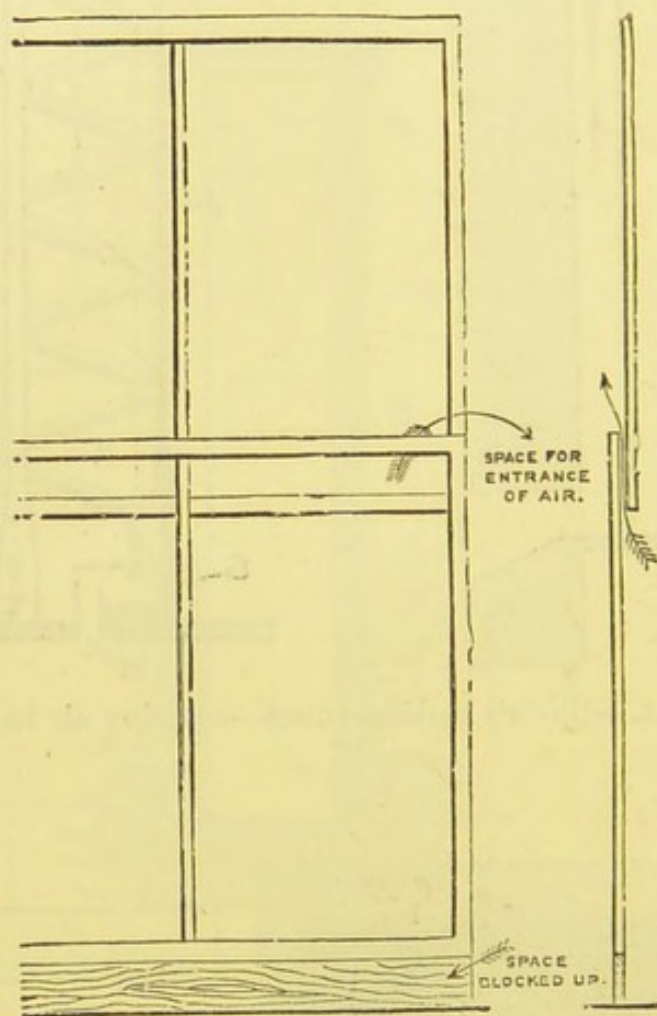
Hinckes-Bird's plan of window ventilation.
